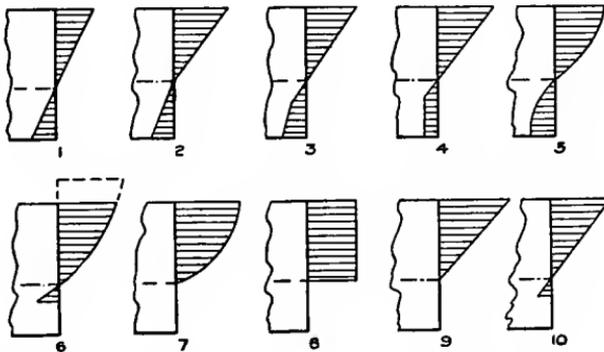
DISTRIBUTION OF FIBER STRESS IN REINFORCED CONCRETE BEAMS.
